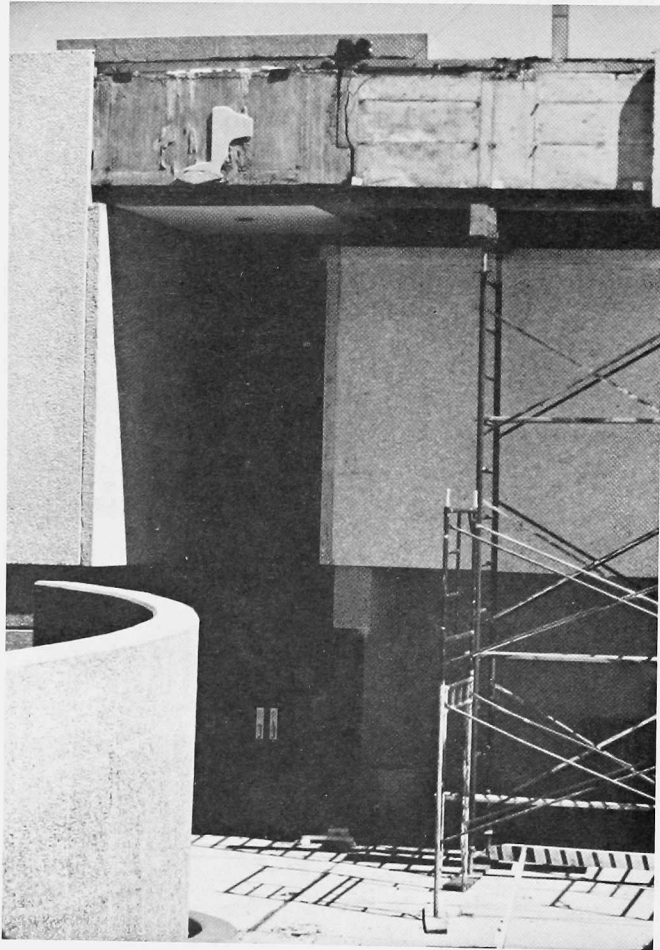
EXPANSION OF CLAY RESULTING FROM WETTING CAUSED THIS SERIOUS MAJOR STRUCTURAL FAILURE AT THIRD-FLOOR ROOF LEVEL. THE BUILDING WAS LOCATED IN AN AREA OF KNOWN SWELLING SOILS.
